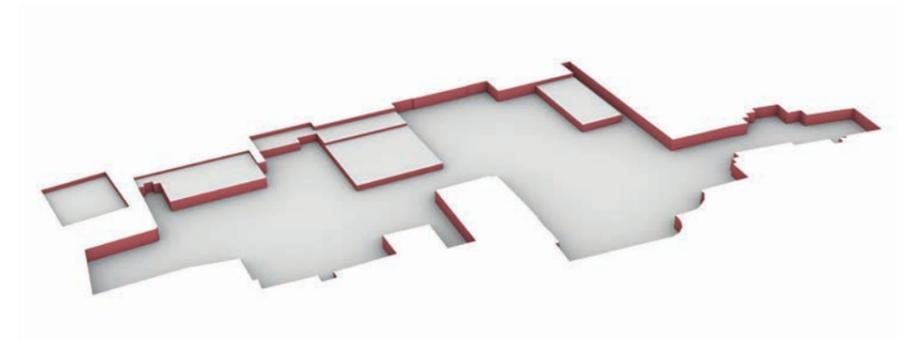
The multi-level existing basement below the Whitgift Centre and Alders
